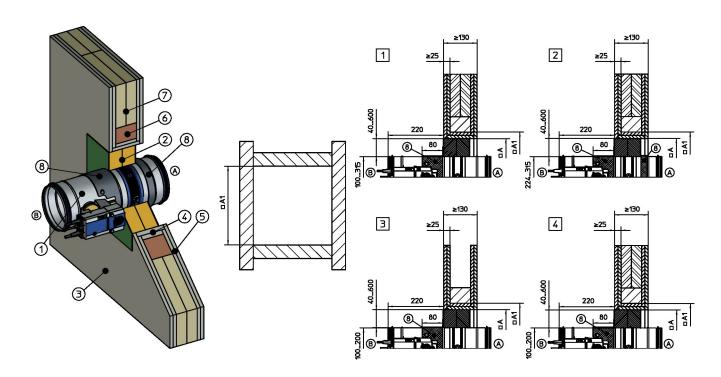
Dry mortarless installation into a lightweight partition wall with timber support structure, use of a fire batt
